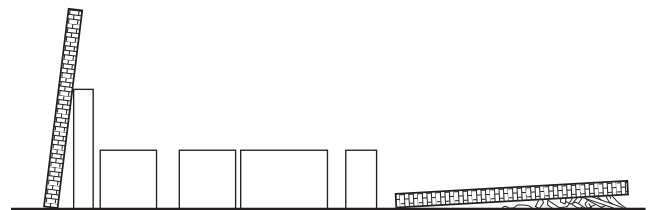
(h) Wind Lift Collapse — Roof Off, Walls Collapse.
